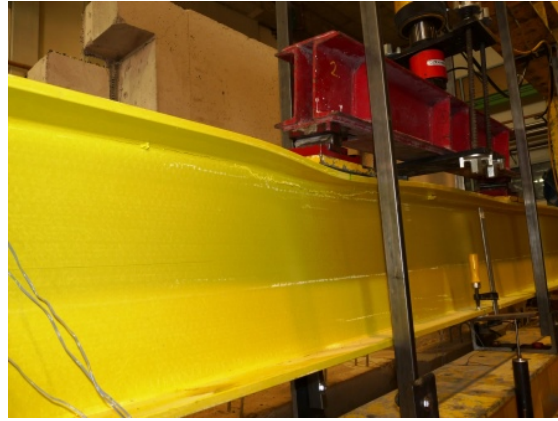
Full-scale flexural tests: failure mode of specimen P400–2, damage on the web–flange junction.
